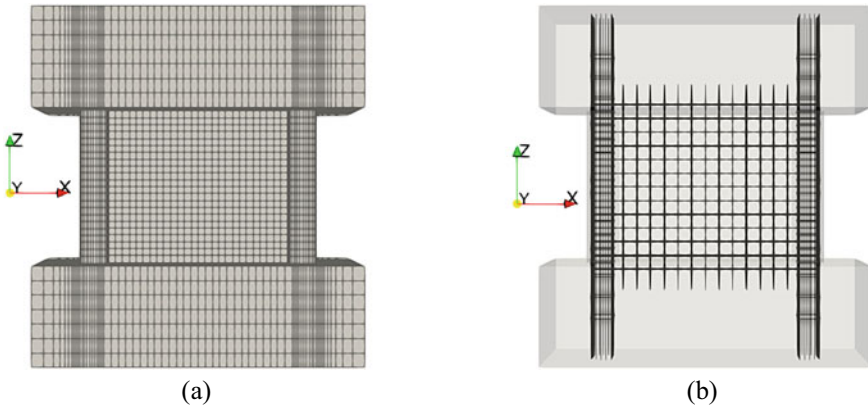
Modelling of the RC wall specimen a 3 dimensional modelling and b modelled rebar reinforcements
